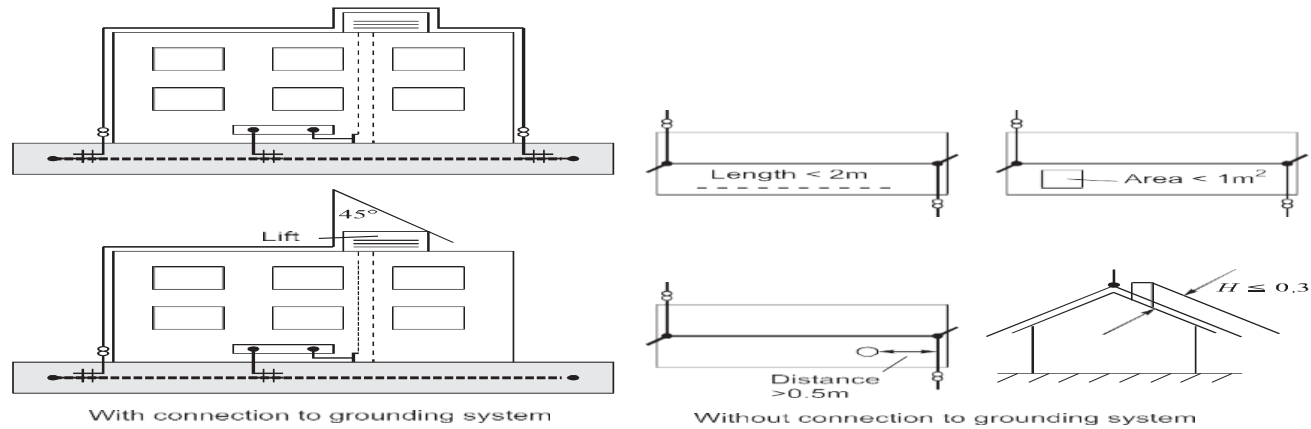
Air terminal - roof superstructures of electrically conductive material [79]
